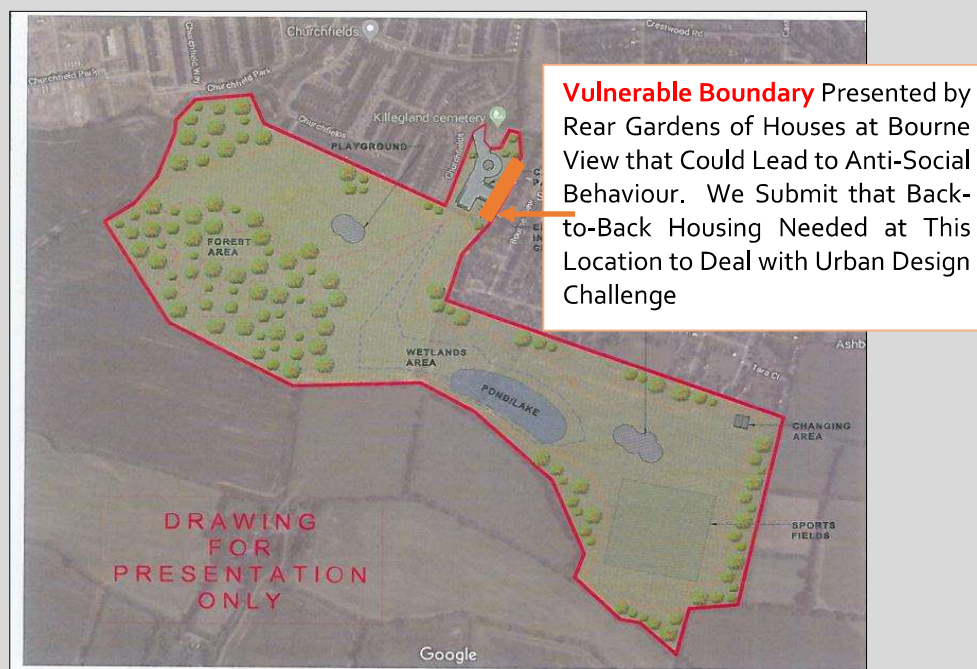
Site Layout Plan of Proposed Park, as annotated by Thornton O'Connor Town Planning to Show the Area with No Passive Surveillance at Subject Site.
